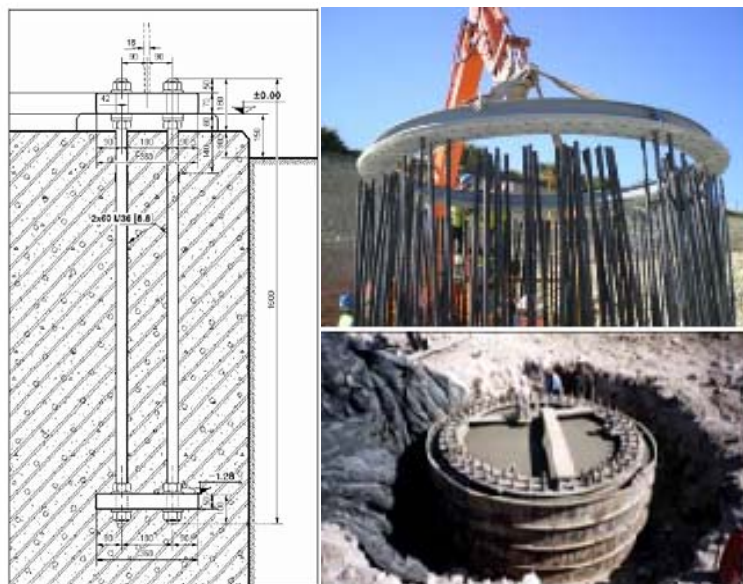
Detail to anchors (left) and in-site arrangement of anchors (right)
